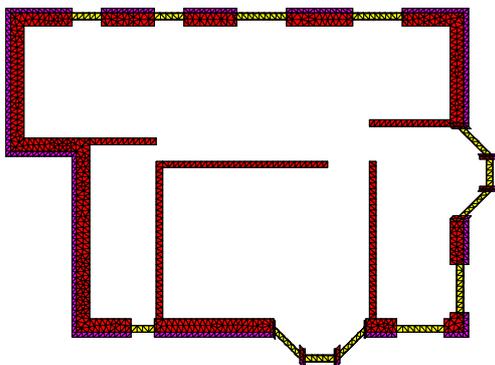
Building plan made of masonry BCA-GBN.35 insulated on the outside with expanded polystyrene
